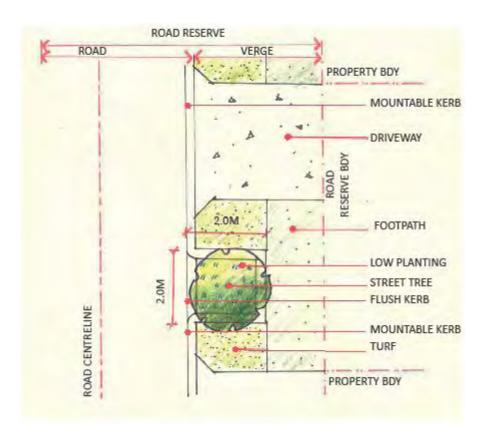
Typical layout plan – with footpath (Scale 1:50@A3)
